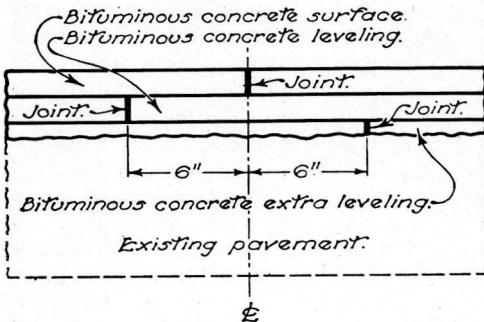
Method of Lapping Longitudinal Joints—Bituminous Concrete Construction.
